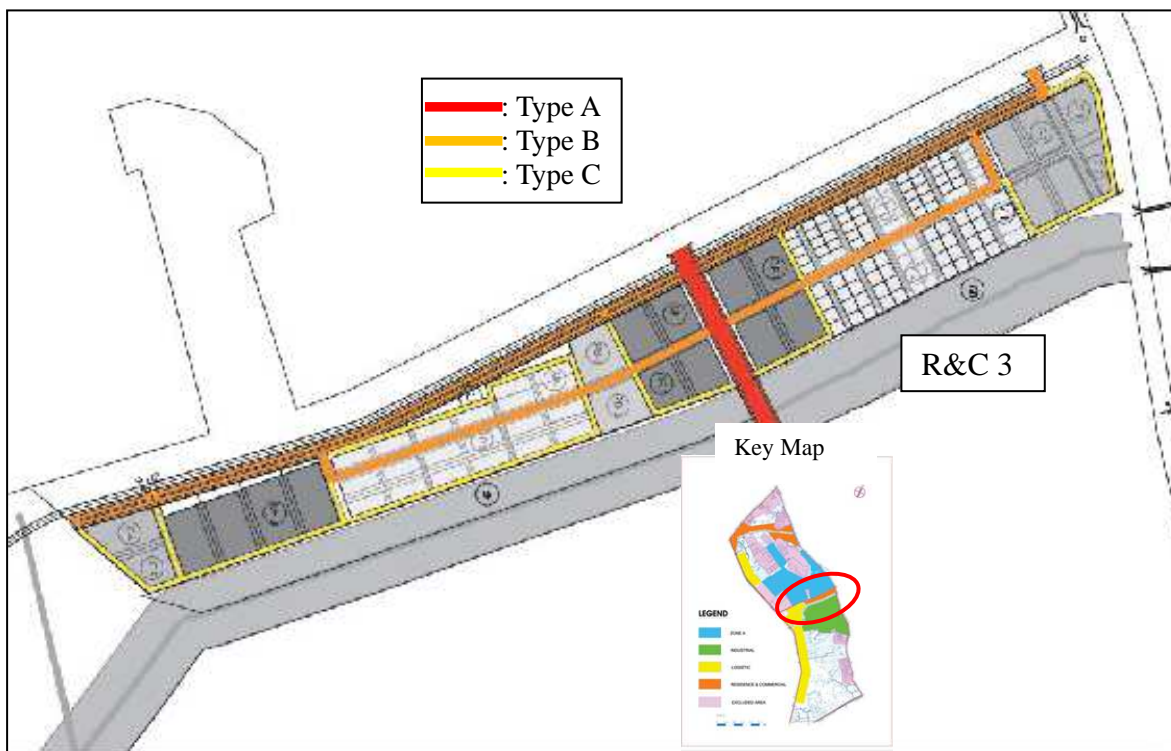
shows the road plan in R&C 2 and R&C 4 zones, and Figure 3.5-2 shows the road plan in R&C 3 zones. The main road go through the project area from the outer road in the east side to the outer road in the west side. The sub road divides each plot and has access road to each block. The type of roads are categorized in three type as Figure 3.5-3. Figure 3.5-4 shows the road plan in LOG 3 zones.
